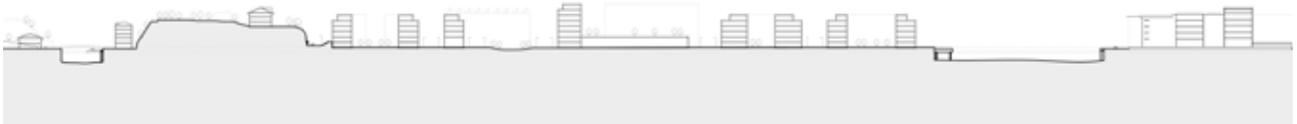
, Top. Proposed plan of South Lindholmen. (YUDW)
